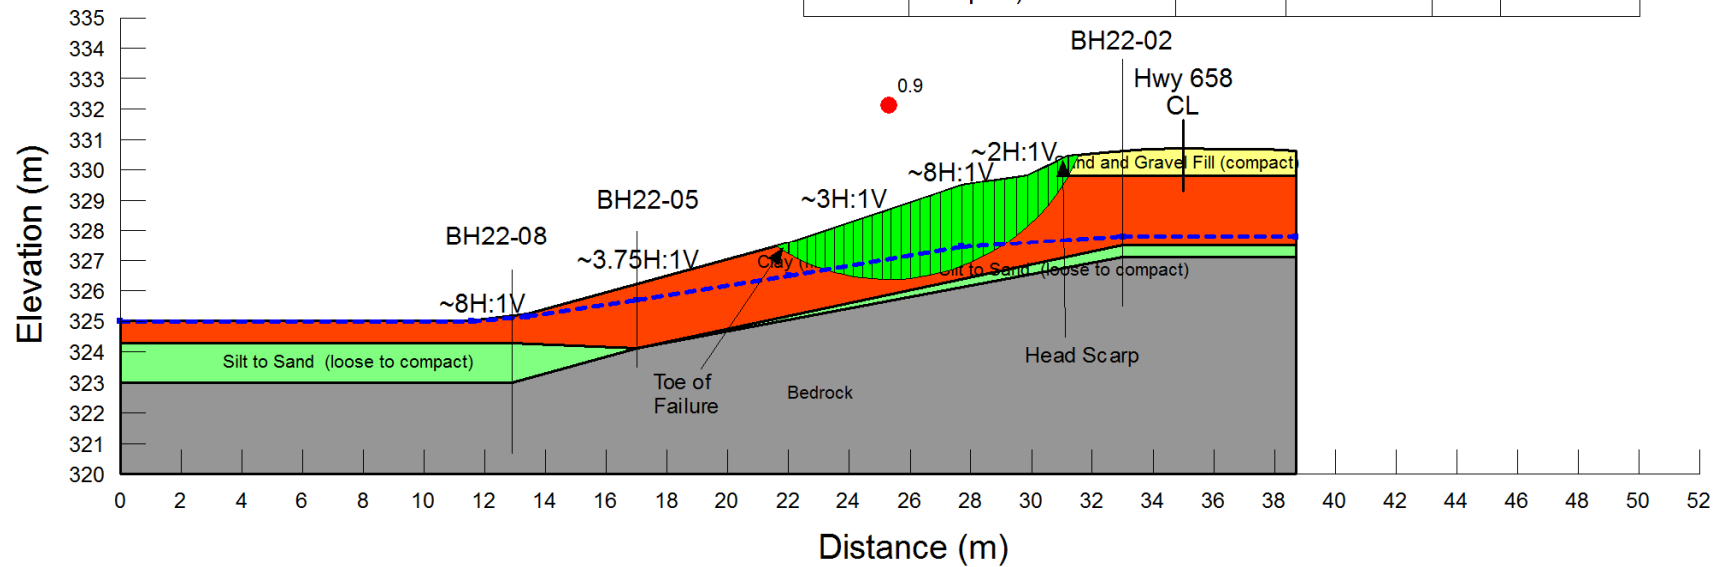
Central Section C-C' (Sta. 21+043) – Slope Prior to 2022 Failure, Assumed Original Slope Profile, Low GWL – Undrained Static Conditions
